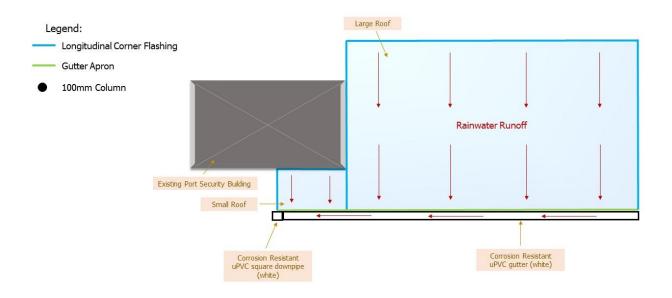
Roof Flashing and Rainwater Runoff Illustration
